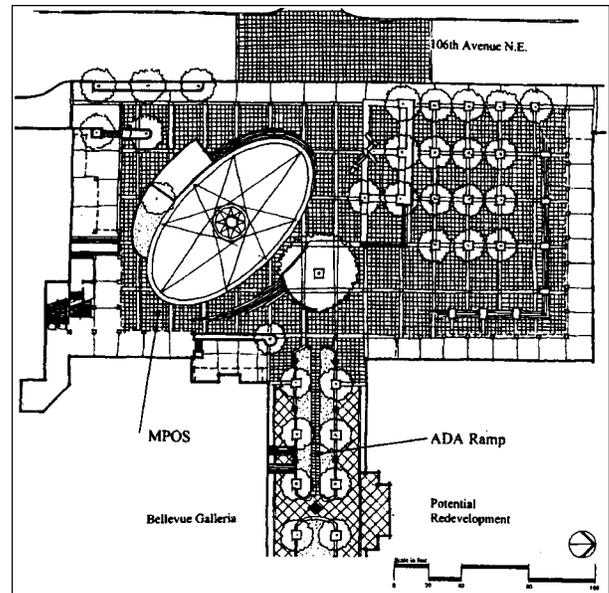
106th Avenue NE MPOS Illustrative Plan
